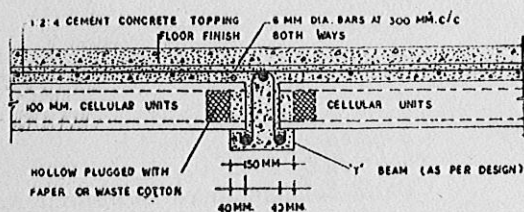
(b) Cellular Units Roof/Floor with 'T' Beam
